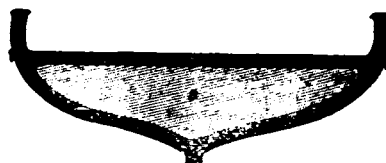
Cross Section at A, showing the method of joining the Sections. Scale 1/4 of an inch to a foot.
